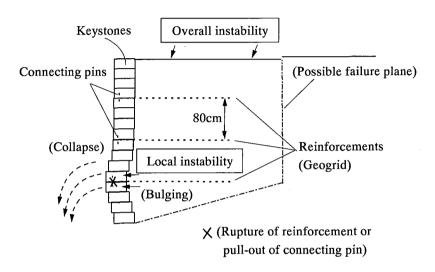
Schematic figure on damage to reinforced-soil retaining walls using keystone blocks for facing
